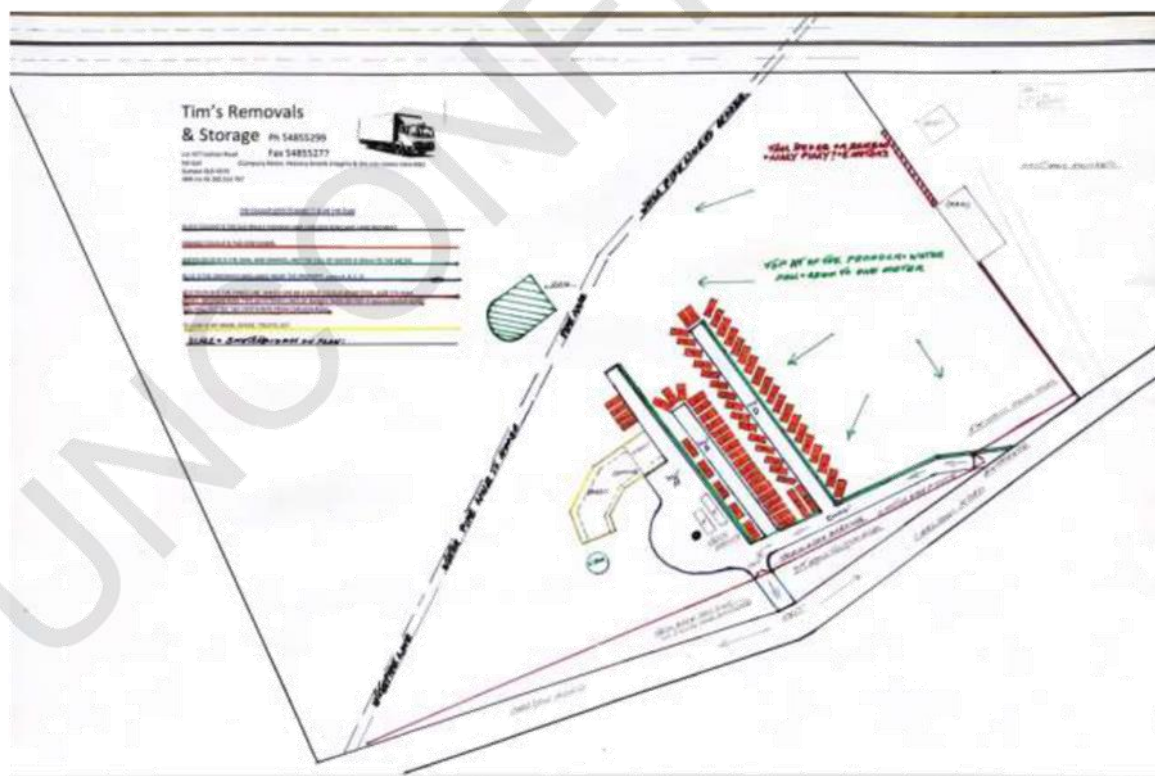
Proposal Plan (Drawn by applicant and submitted after public consultation ended)
